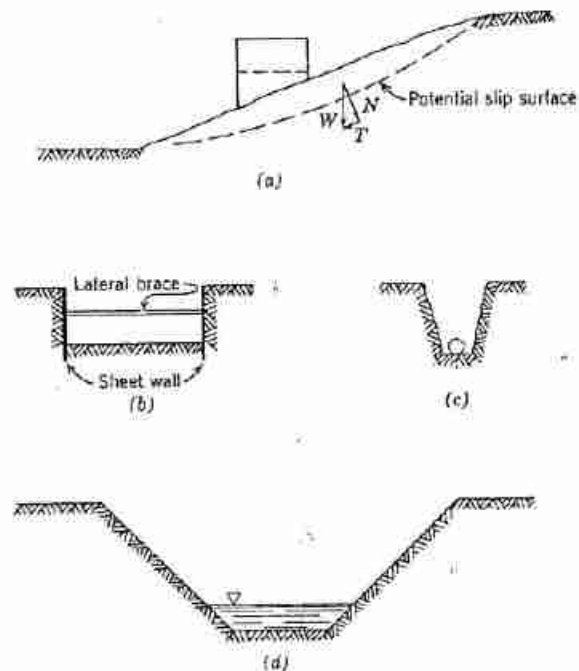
Slopes and excavations. (a) Natural slope. (b) Excavation for building. (c) Excavation for pipe. (d) Canal.
